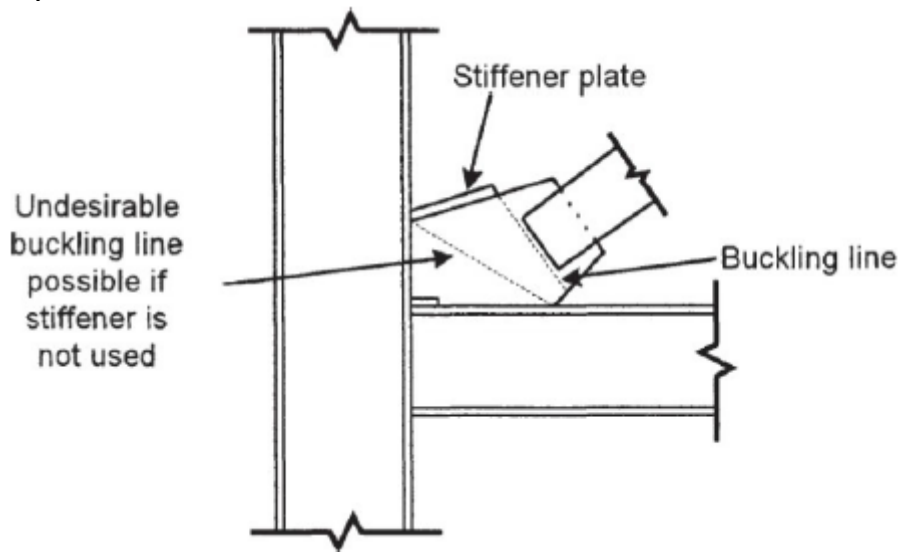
Welded gusset plate connection featuring a stiffener plate to control buckling (Tamboli 2016, p. 354).
